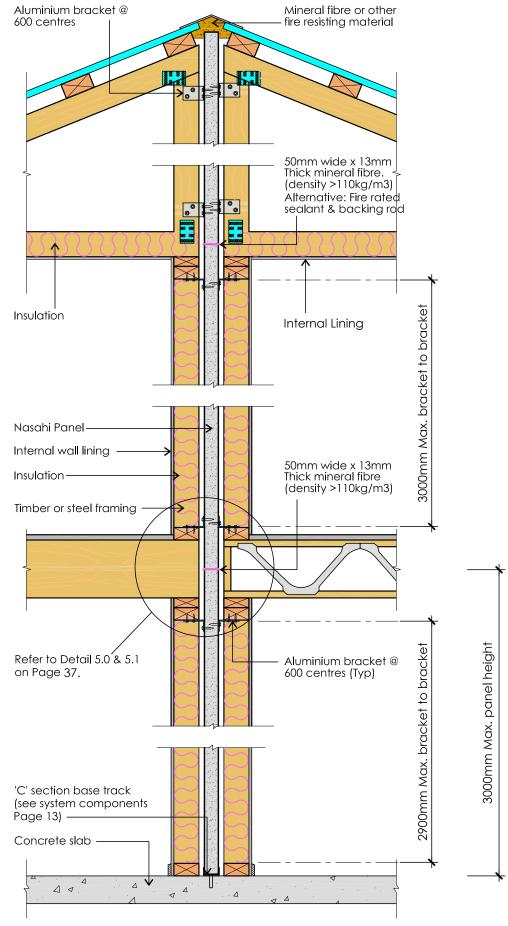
Base Slab Connection (Aluminium Wall Bracket)
